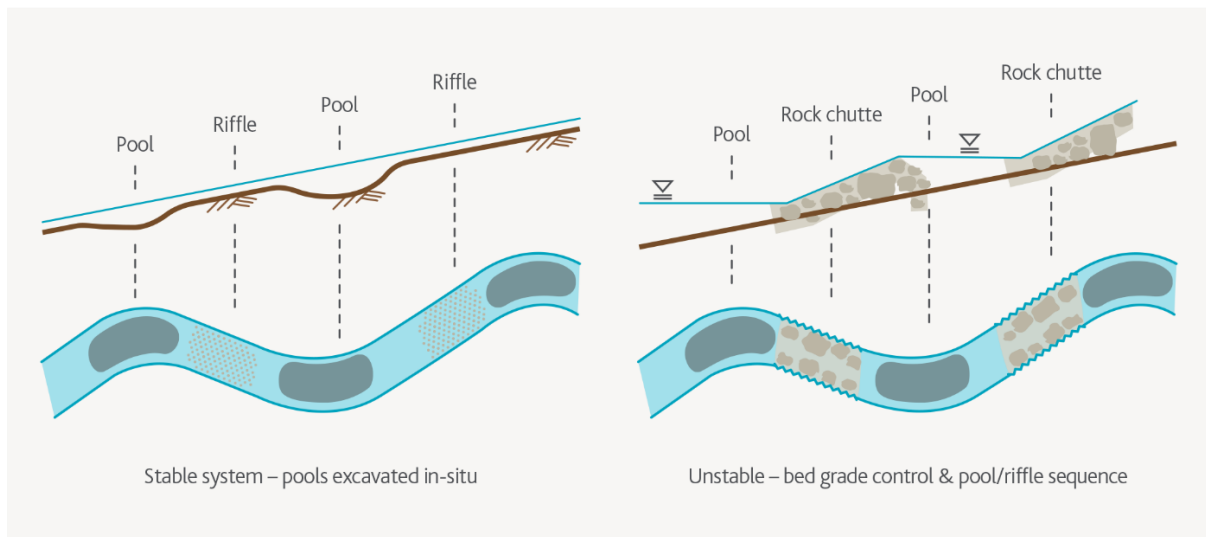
Conceptual diagram of two approaches to pool-riffle construction
